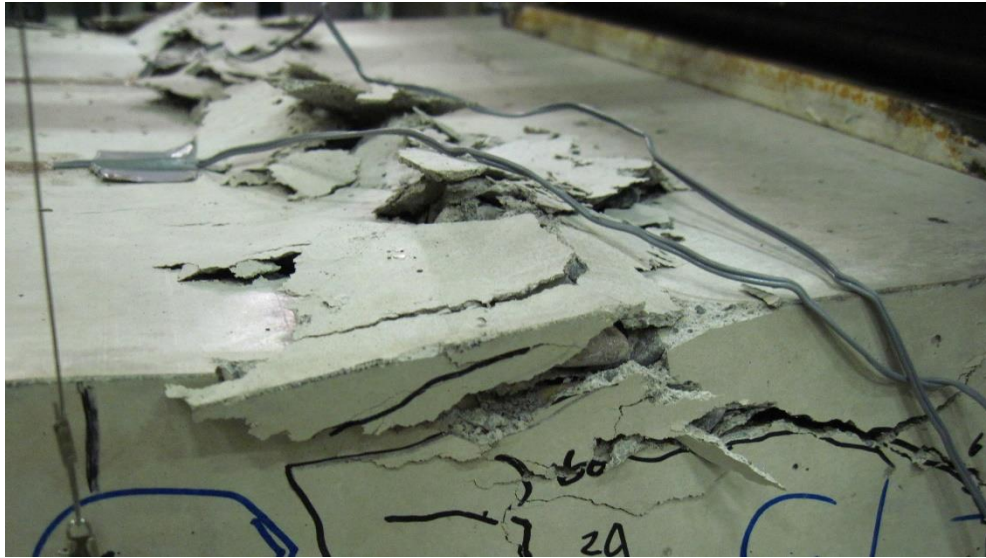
Control wall at failure with crushed concrete lifting at surface.
